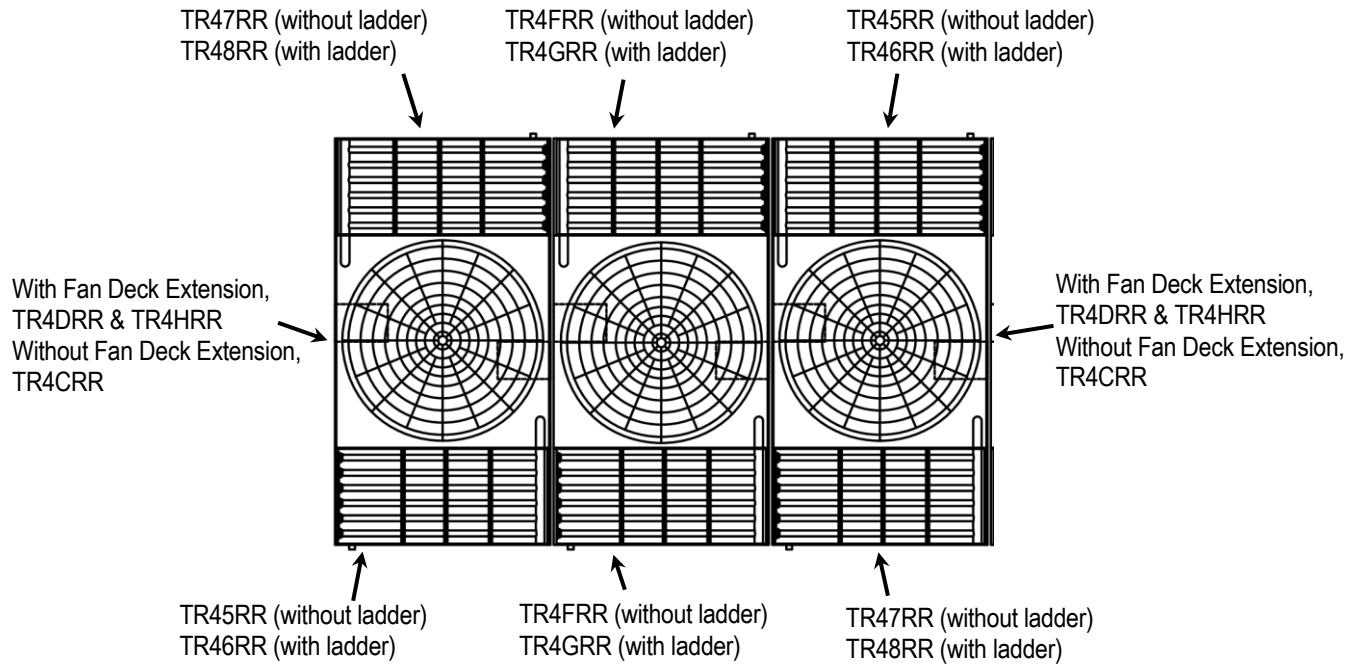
Multi-cell Fan Deck Handrail Reference Drawing Arrangement
